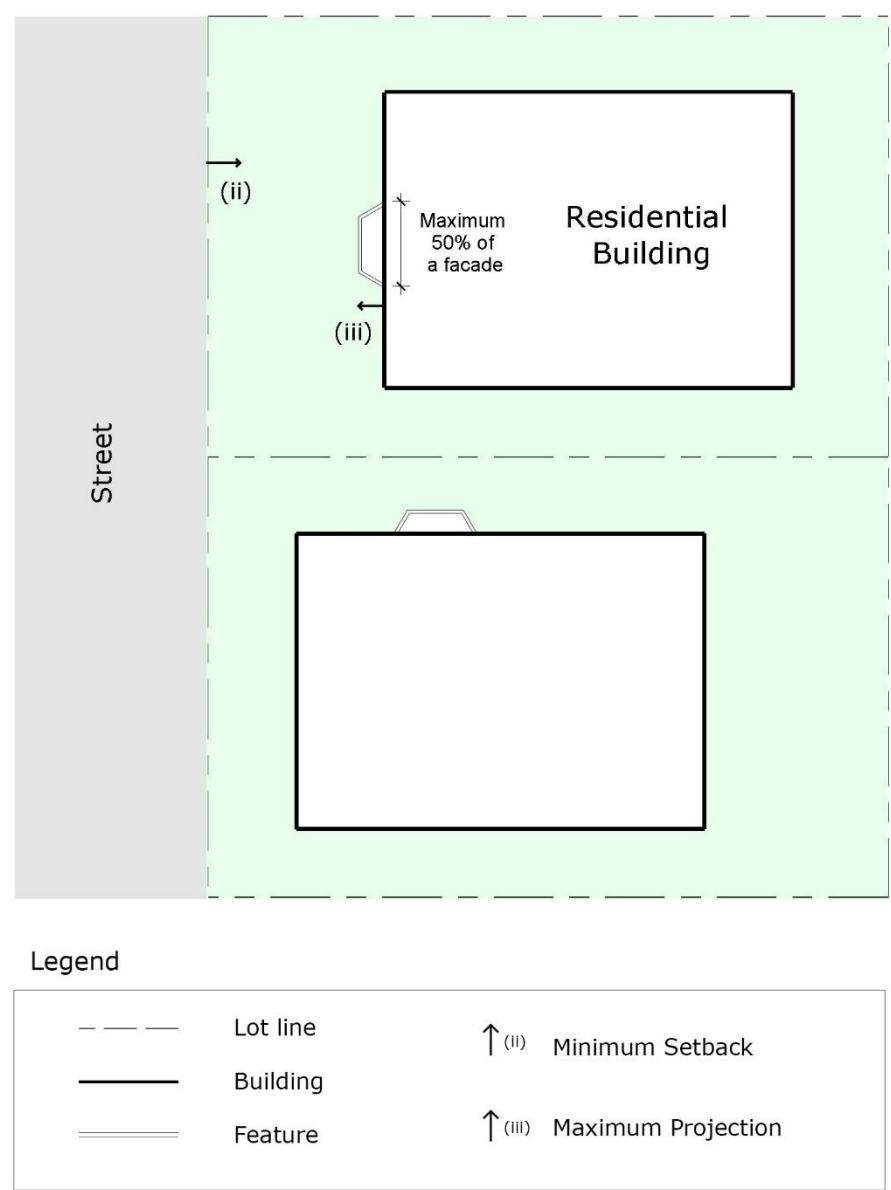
demonstrates the maximum permitted projection and the minimum setback for bay windows. The top image shows a bay window projecting into the front yard of a residential building.
